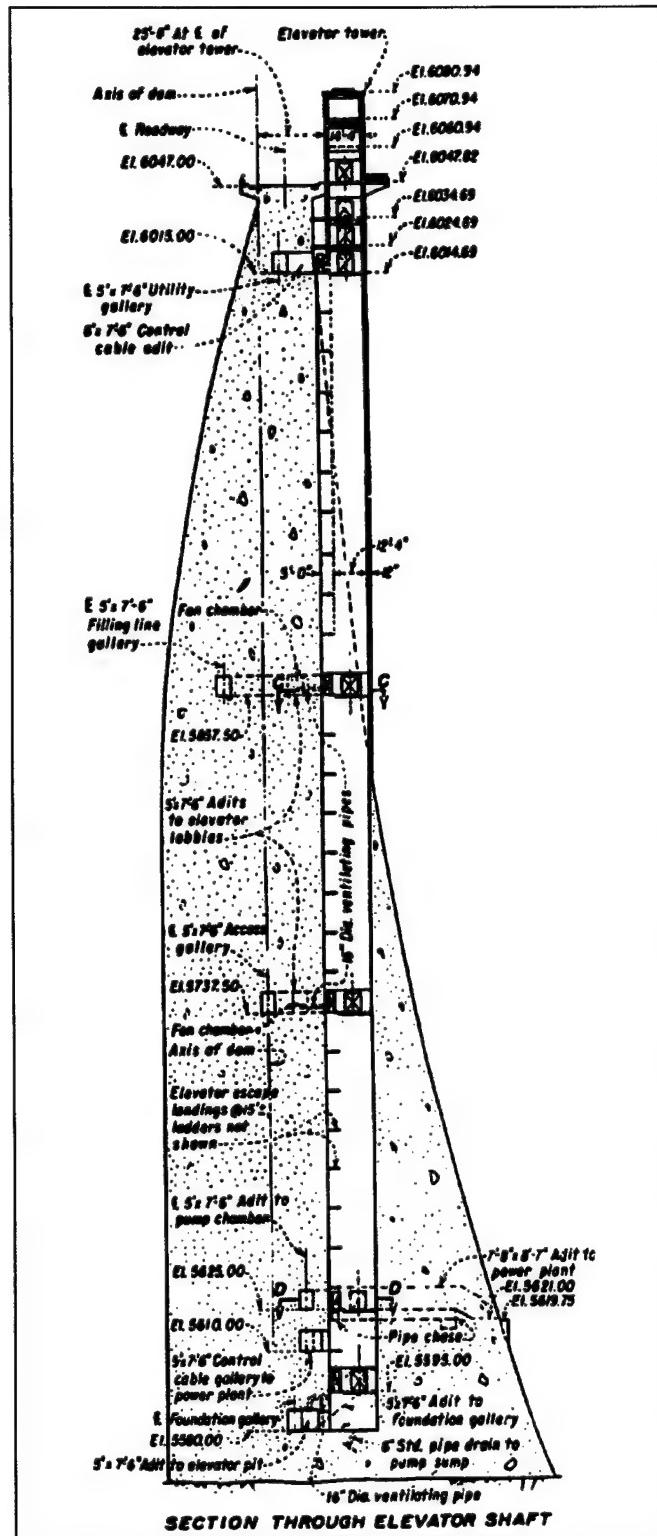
Structural and architectural layout of elevator shaft and tower in Flaming Gorge Dam (USBR) (Continued)
